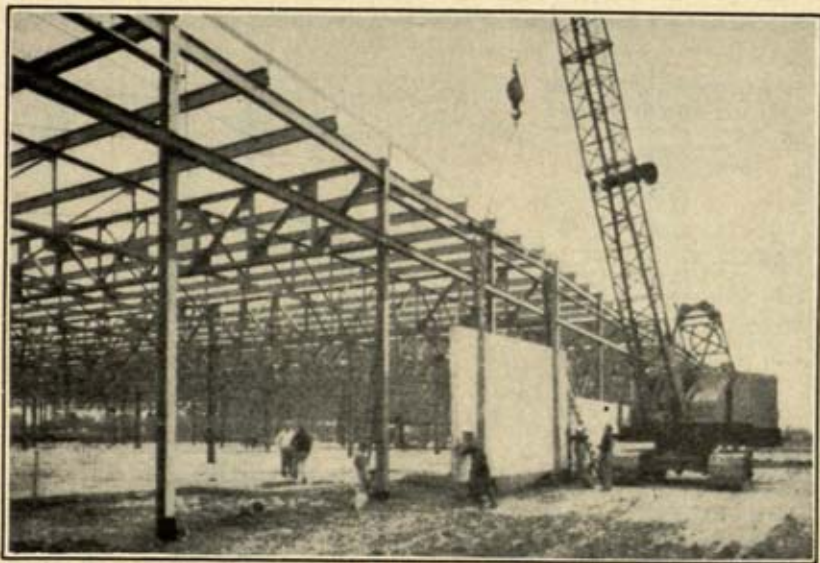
Setting a precast wall panel in position with a six-man crew and a crane. (*Engineering News-Record.*)
